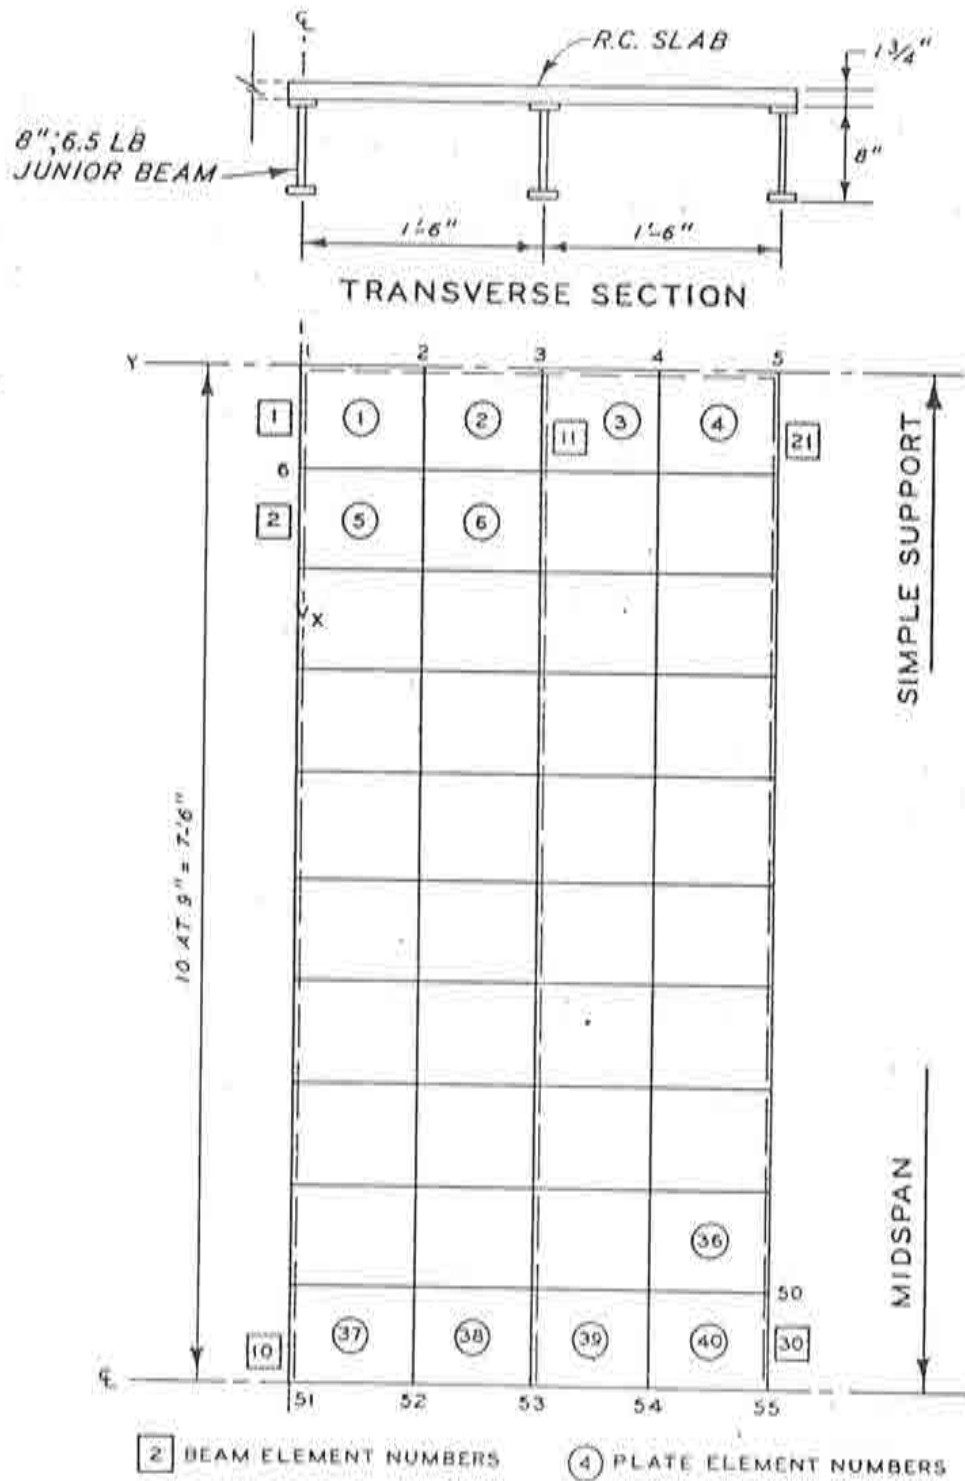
Discretization of simply supported mixed steel-concrete bridge.
